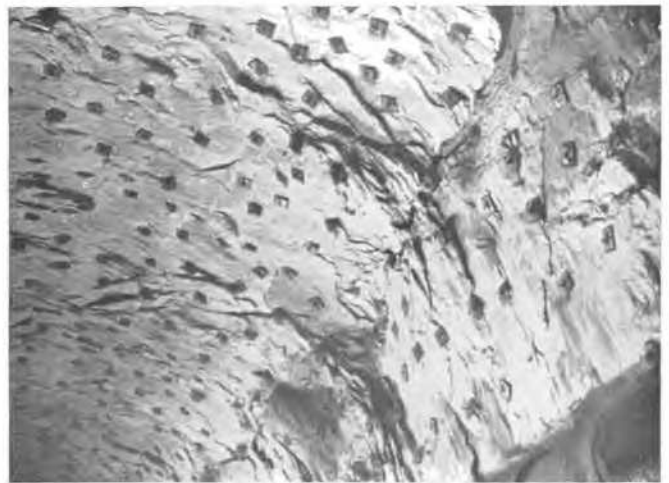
Mont Blanc Tunnel, French side. Anchorage.
